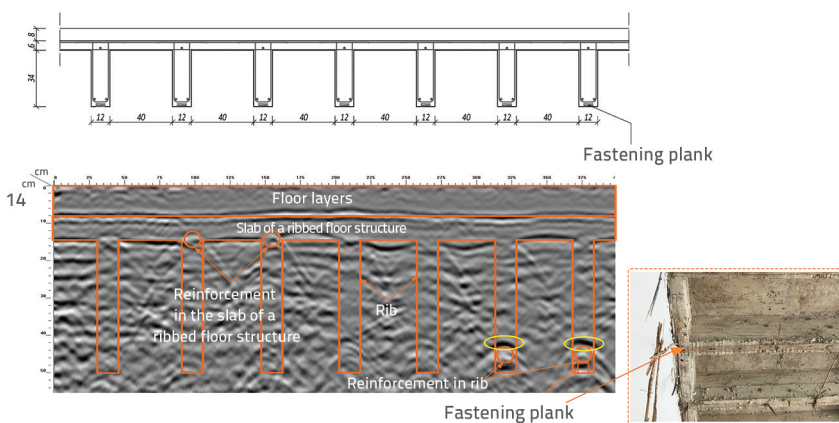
GPR reconstruction of ribbed floor structure based on radargram 14.
